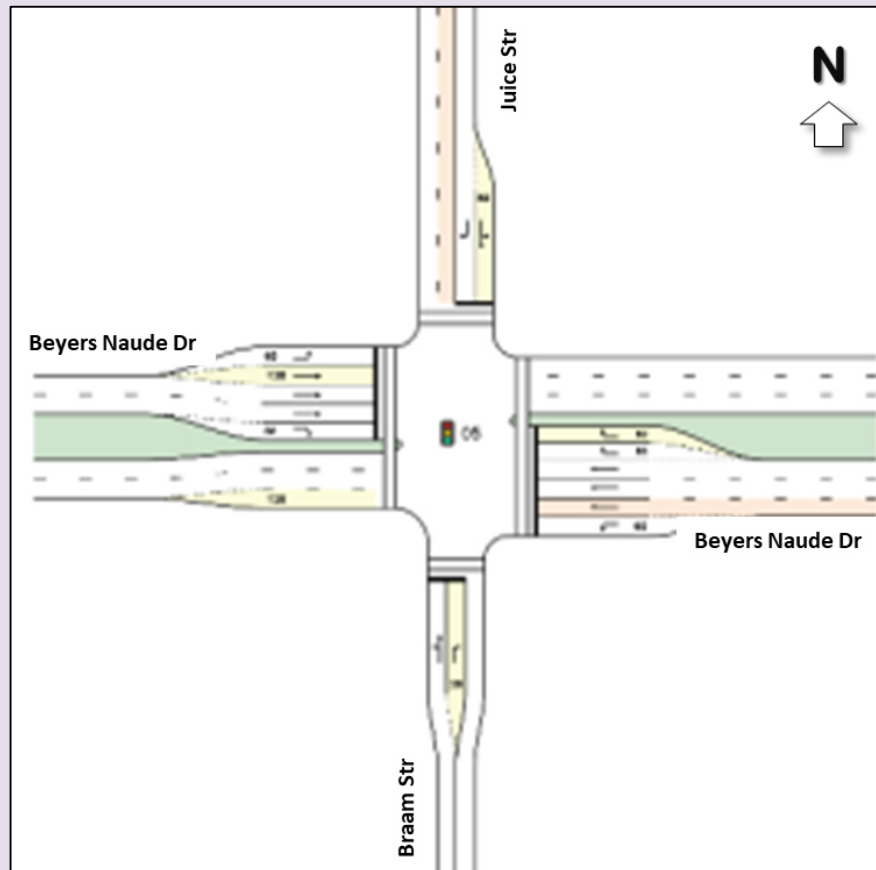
Proposed upgrades for Beyers Naude Drive, Juice Street and Braam Street Intersection
